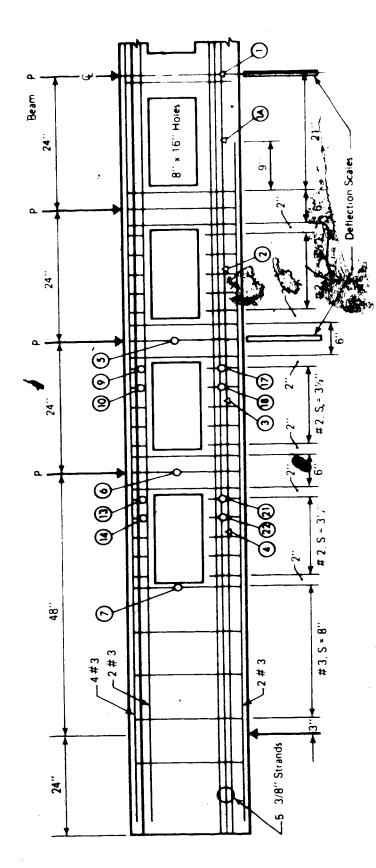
Reinforcement Details and Strain Gage Locations for Beam 9-16-7L
